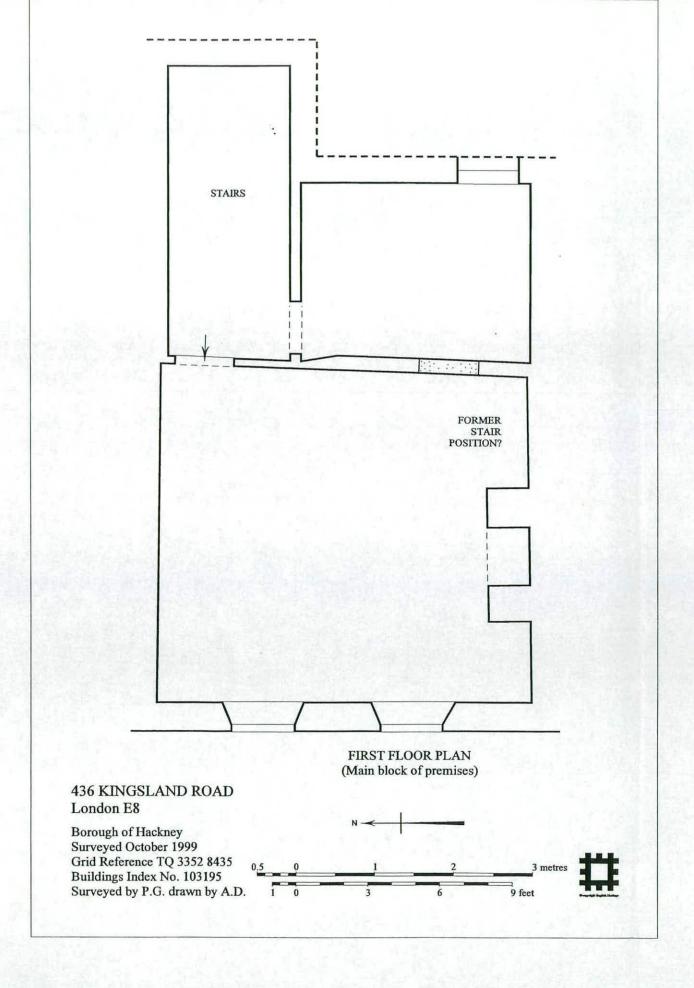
No. 436 Kingsland Road, first-floor plan in 1999.
